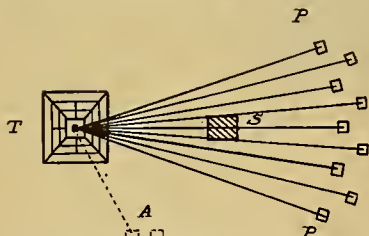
NEW "WIRELESS" PLANT FOR EIFFEL TOWER, SHOWING STONE ANCHOR PILLARS FOR AERIAL WIRES
